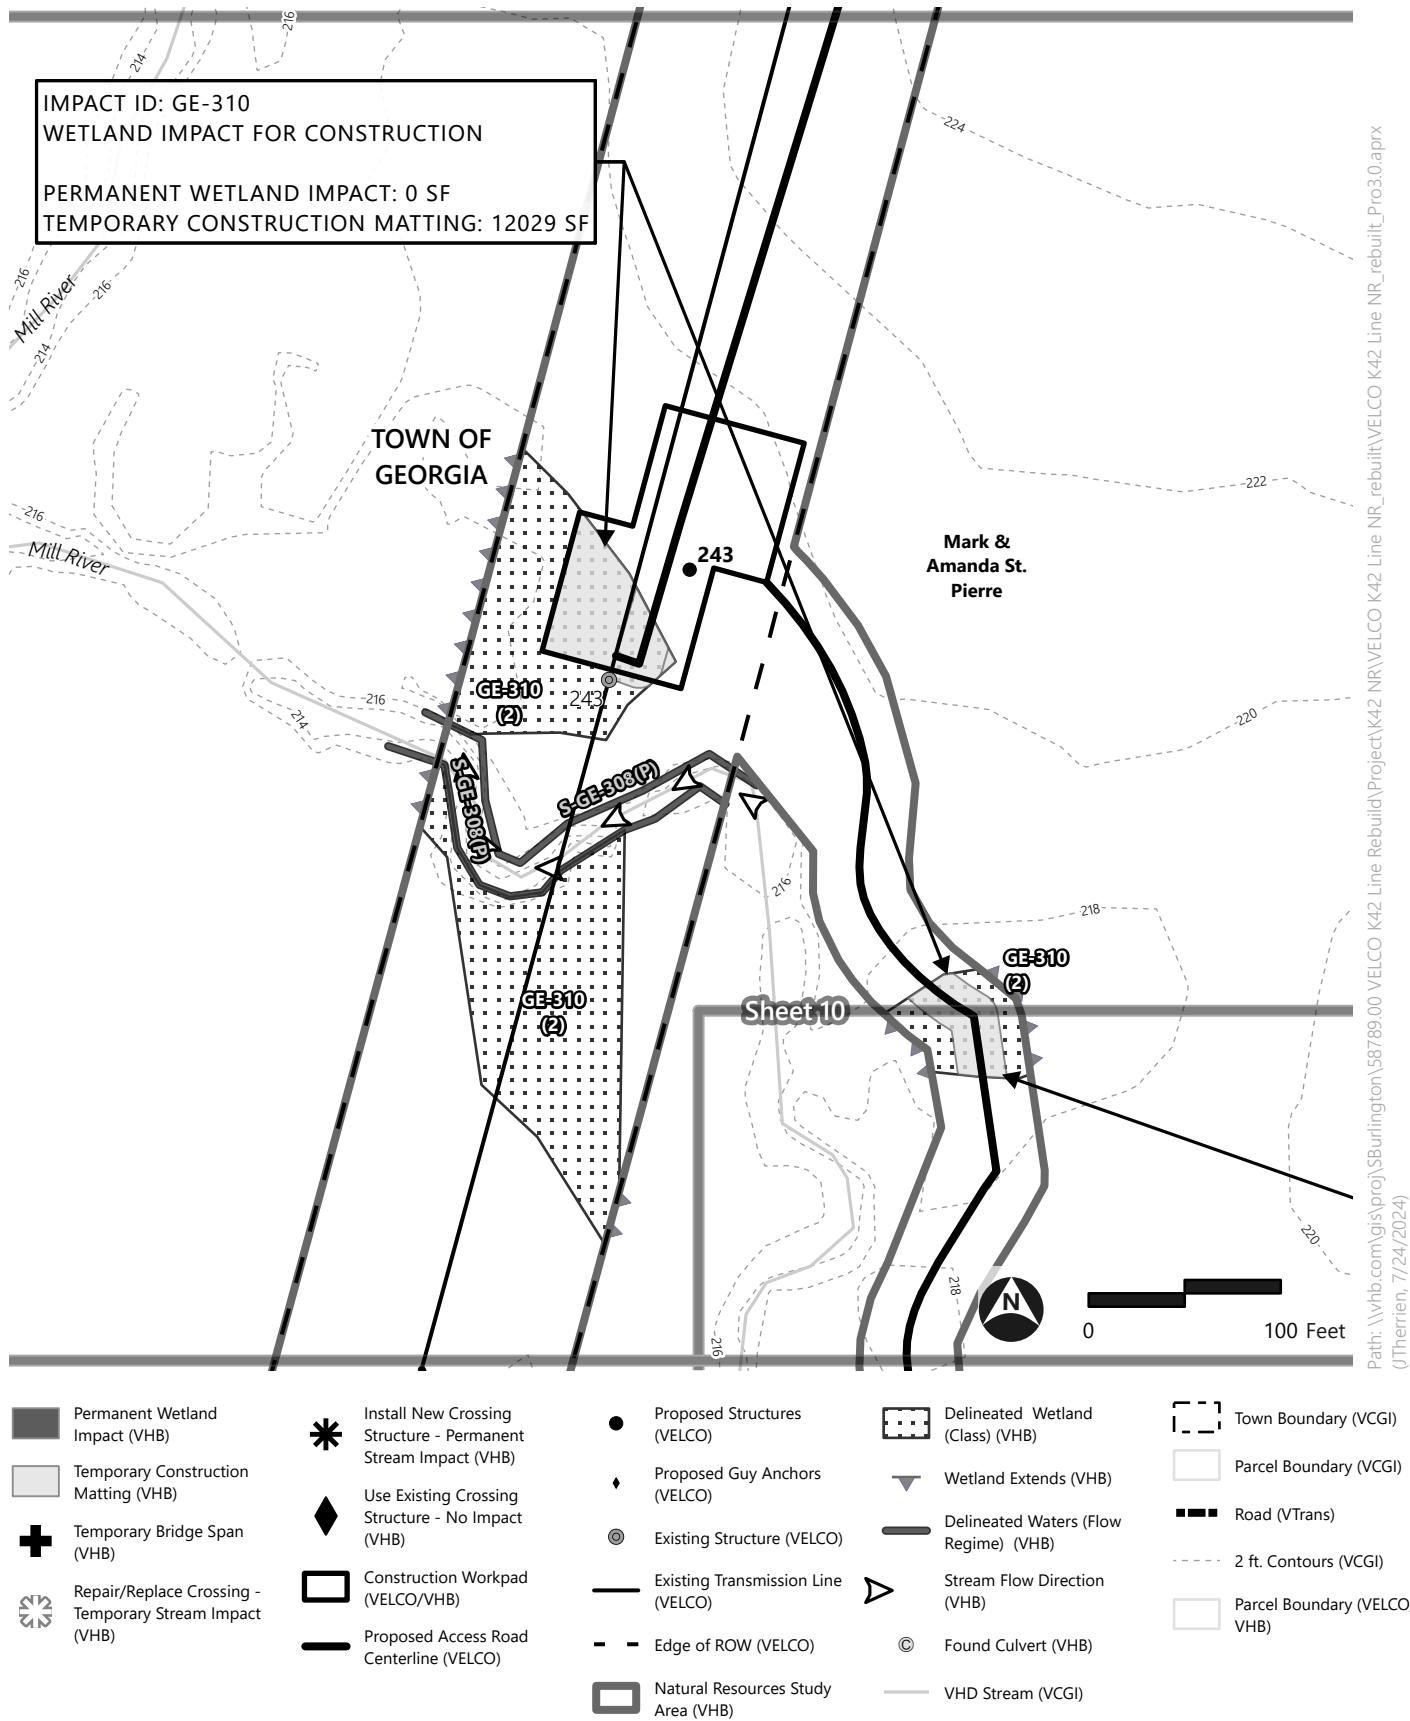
USACE Section 404/10 Individual Permit - Impact Exhibits - Sheet 10 of 47
